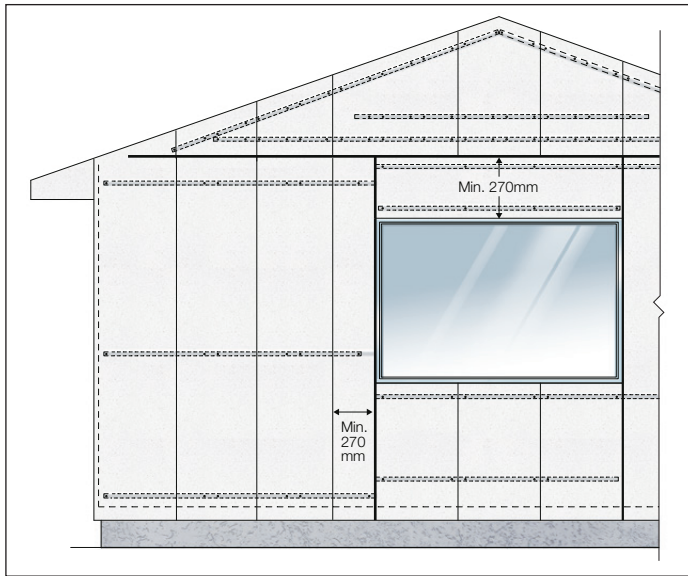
TYPICAL SINGLE STOREY PANEL LAYOUT
